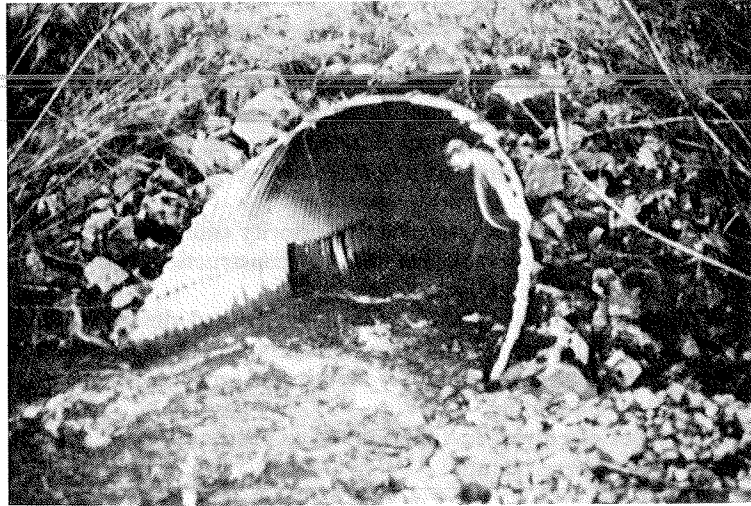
Culvert on footings to retain natural streambed for fish passage.
